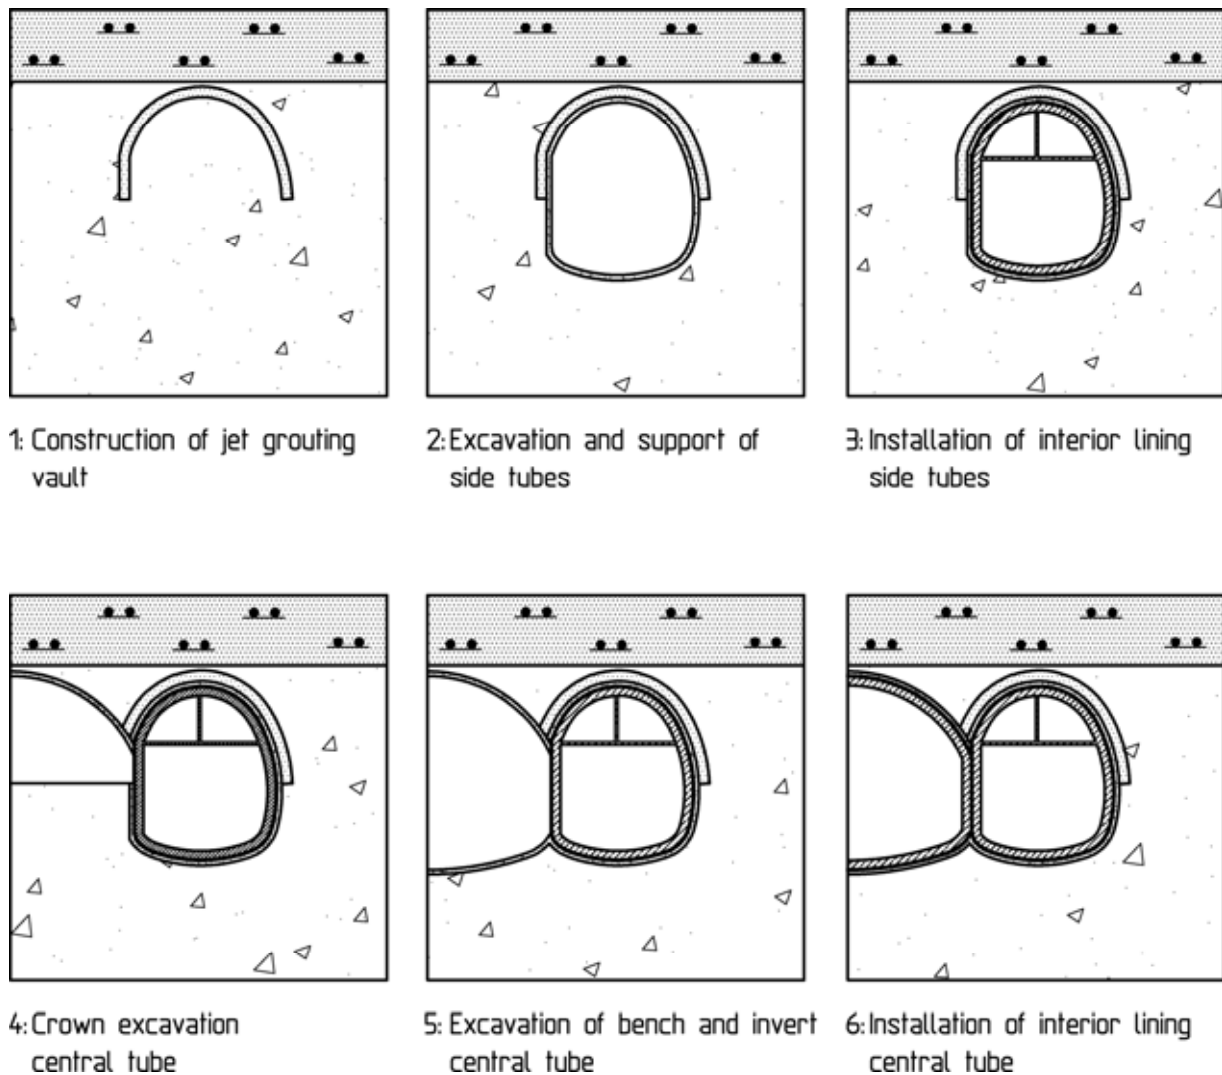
Excavation sequence/construction stages for the tunnel tube divided into three sections
